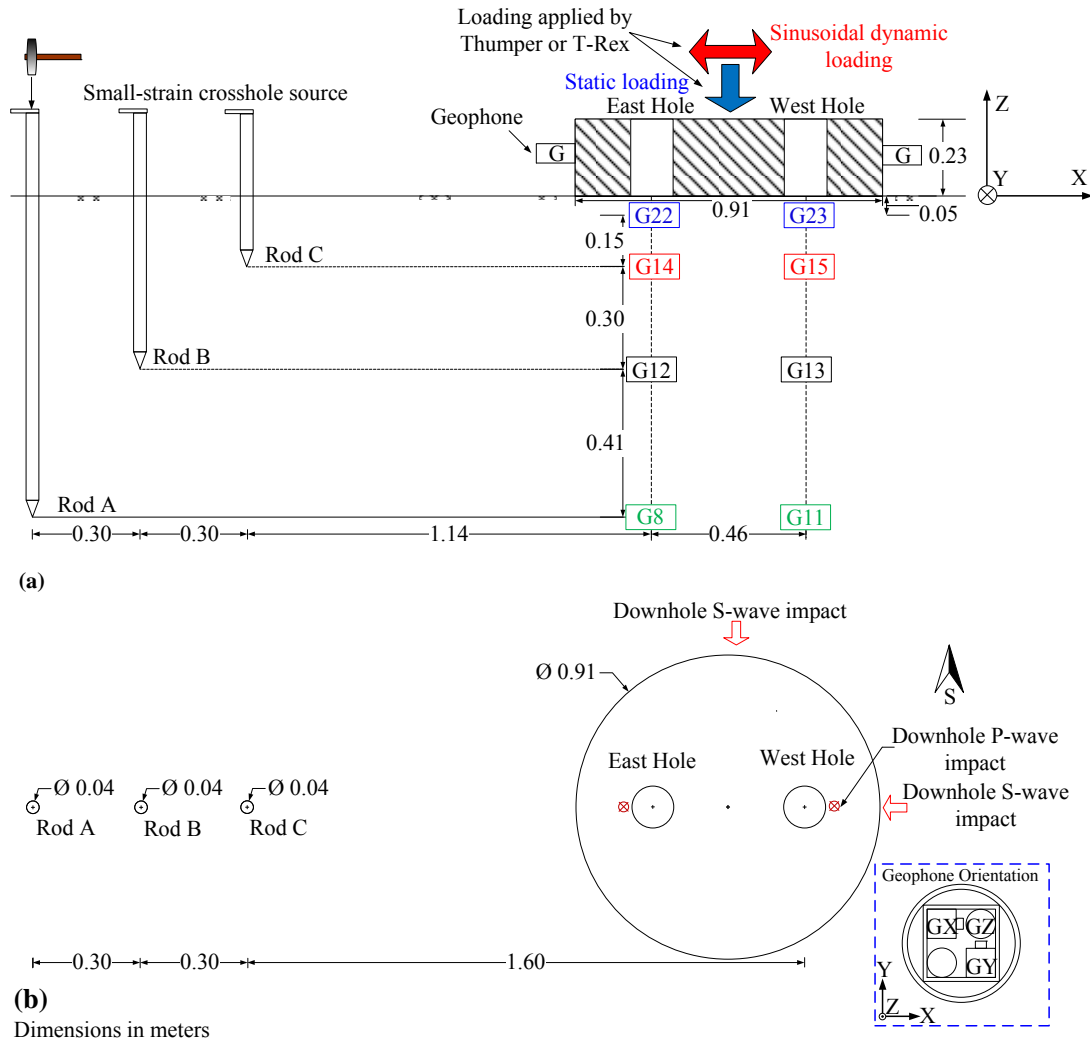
Testing setup in location 3 at the LRL: (a) cross-section and (b) plan views.
